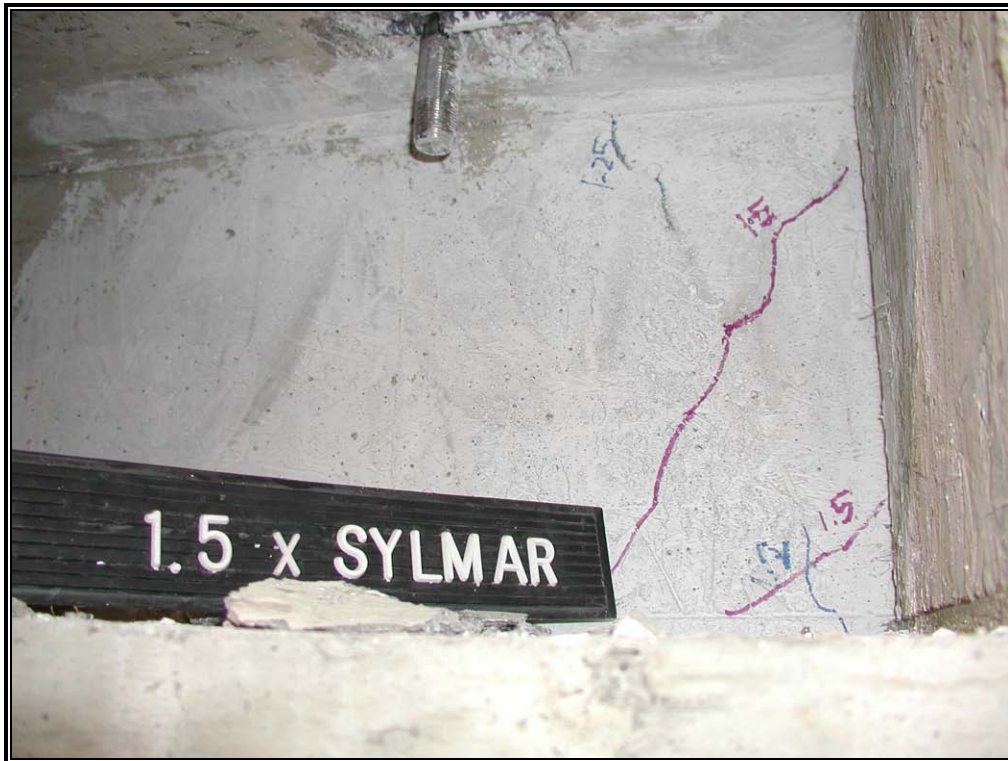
Shear Cracks in East Beam-Column-Joint
